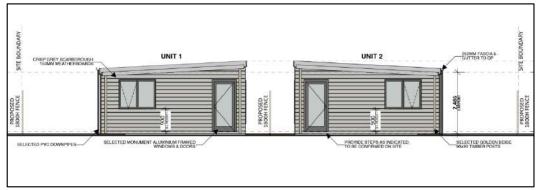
Proposed dwellings (Source: Applicant supplied)
